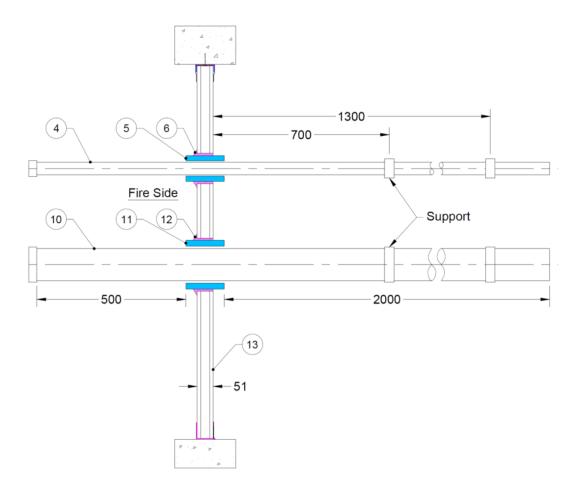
Plan view and cross sections of test specimen and cut hole locations as shown in EWFA2798800.1 – dimensions in mm
